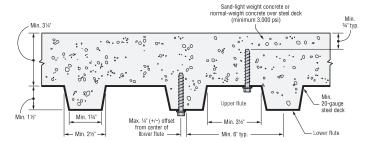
Installation of 1/4"-Diameter Anchors in the Soffit of Concrete over Steel Deck
